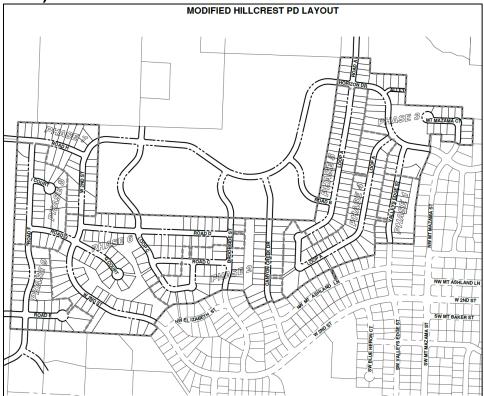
Plan as Proposed with Planned Development Amendment (PDA 1-24/ S3-24)
